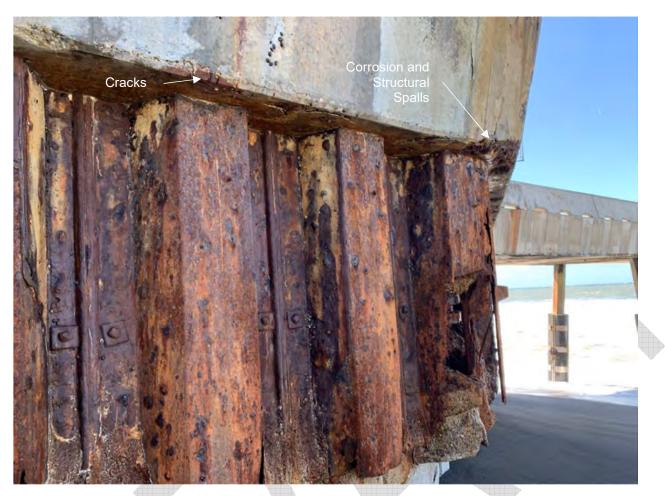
Pier Abutment Wall and Concrete Cap – North Face
